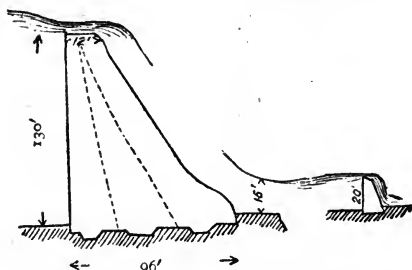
CROSS-SECTION OF TURLOCK DAM.
